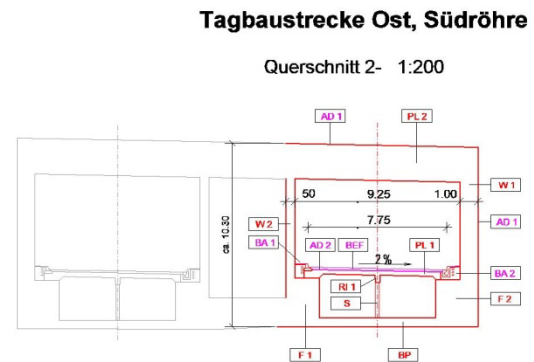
Rosenberg tunnel, cross section built by open cast mining
